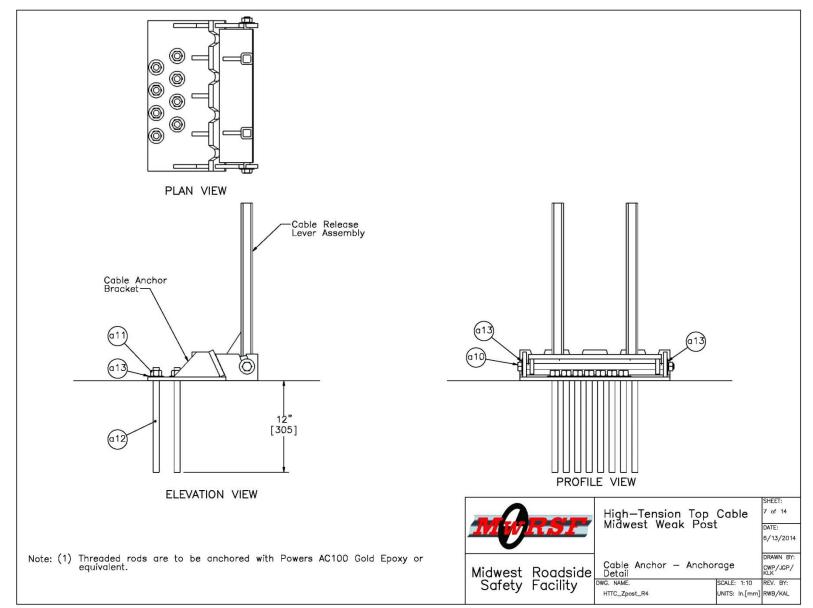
Cable Anchor – Anchorage Detail, Test No. HTTC-2
